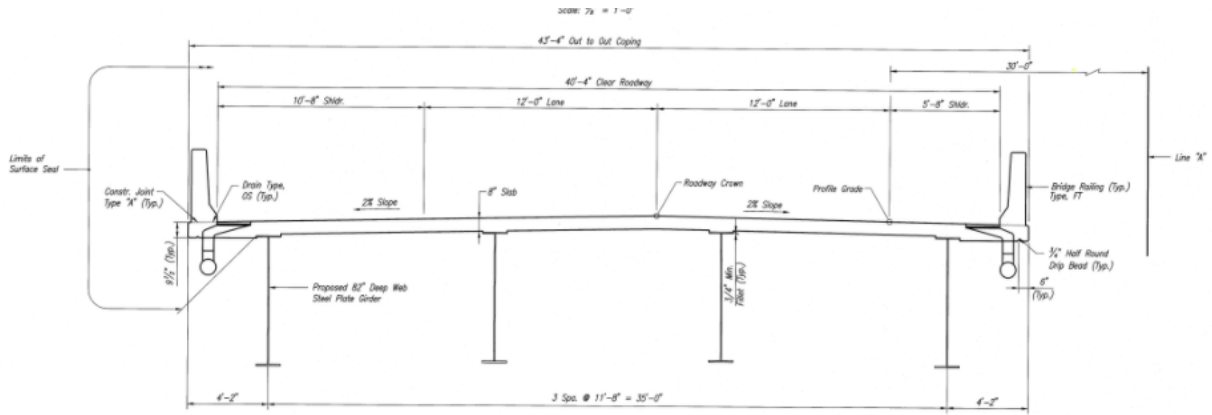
Typical Section of the Bridge (NBI 80182) (2010)
